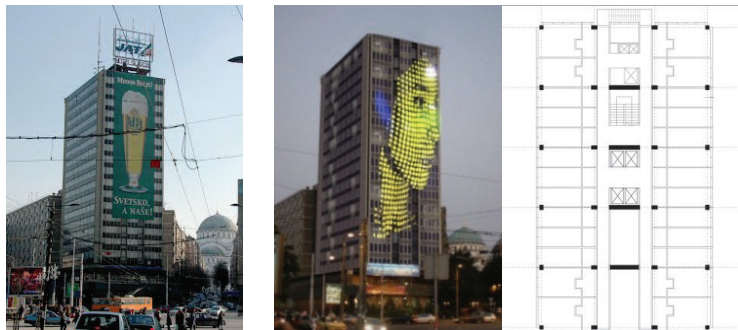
The Slavija Hotel –a) current south-west facade, b) media facade, 3D model; c) level plan (photos and draft made by the authors)
